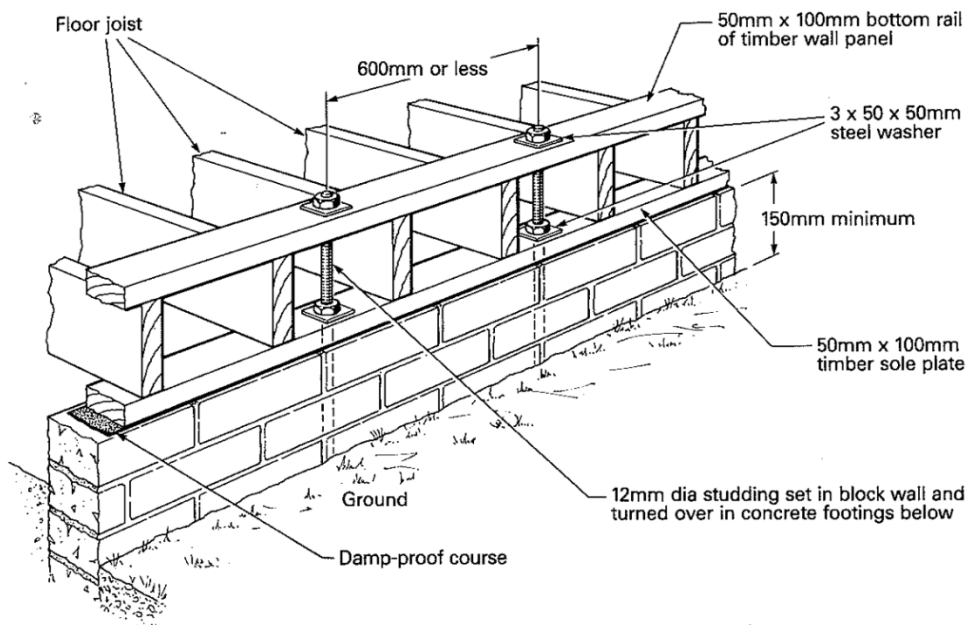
Floor joist connections to masonry wall (Mayo, 1988)
